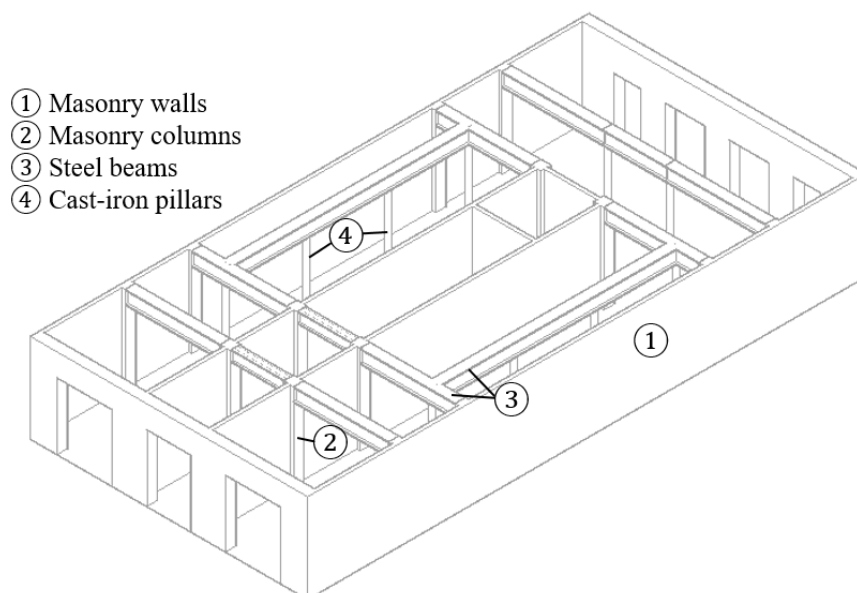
Example of a typical ground floor of a rectangular shape building typology in the *Eixample* district (including unreinforced masonry walls, masonry columns, steel beams and cast-iron pillars).
